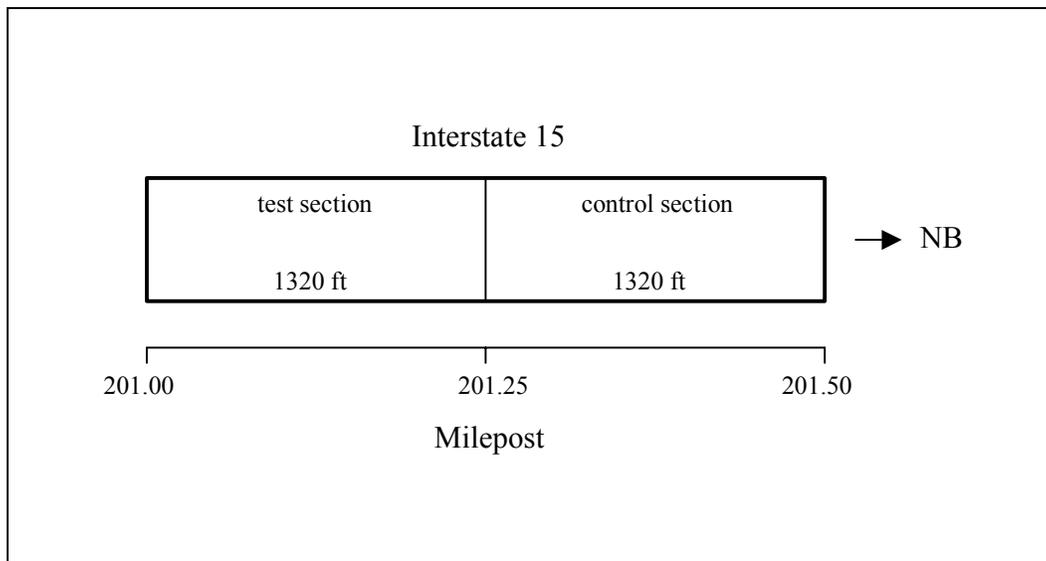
Layout of the Test Site at Lincoln Road-Sieben
